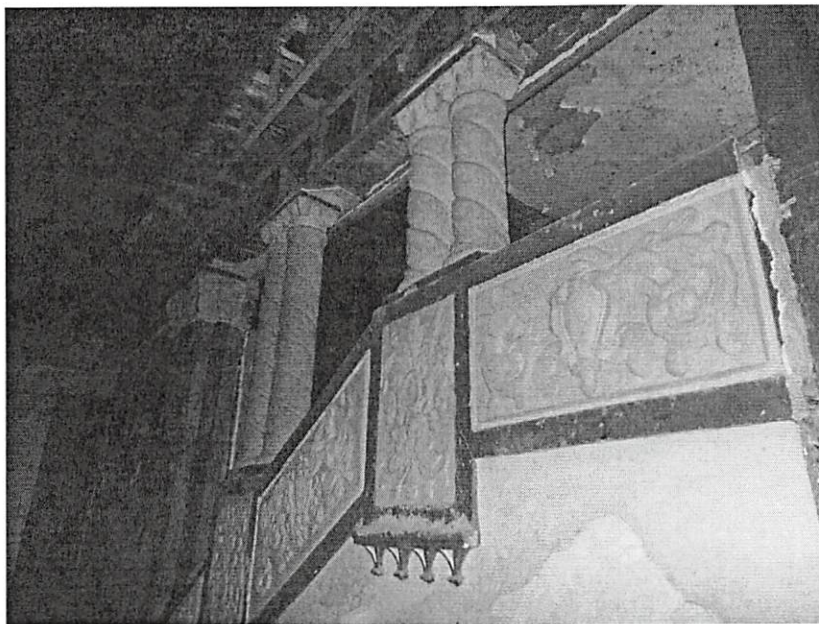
Historic plaster decorative details at first-floor lobby stairs of the Palace Hotel
